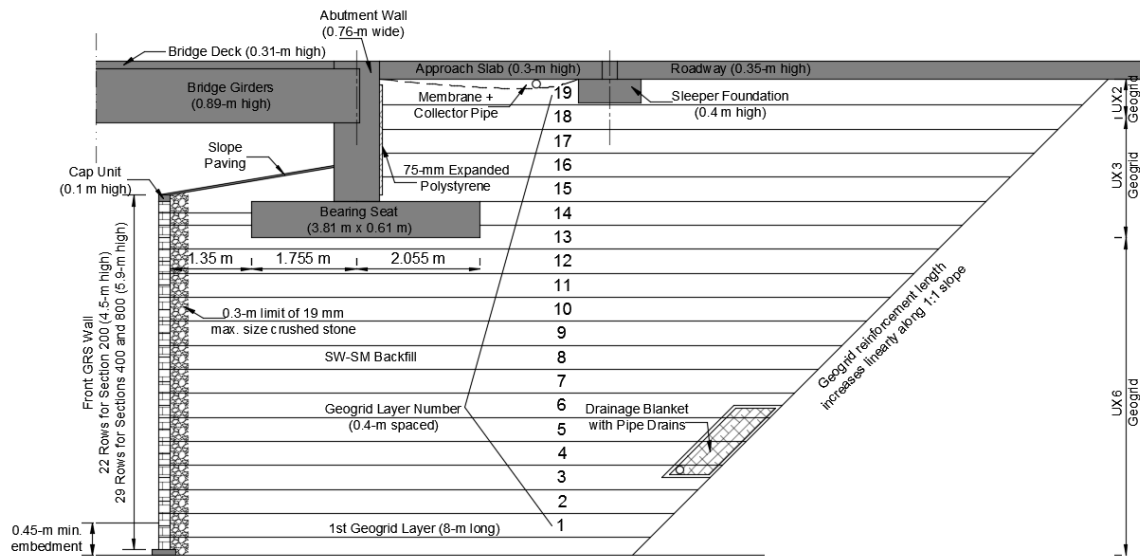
Founders/Meadows Bridge abutment cross-section (redrawn after Abu-Hejleh et al. 2002).
